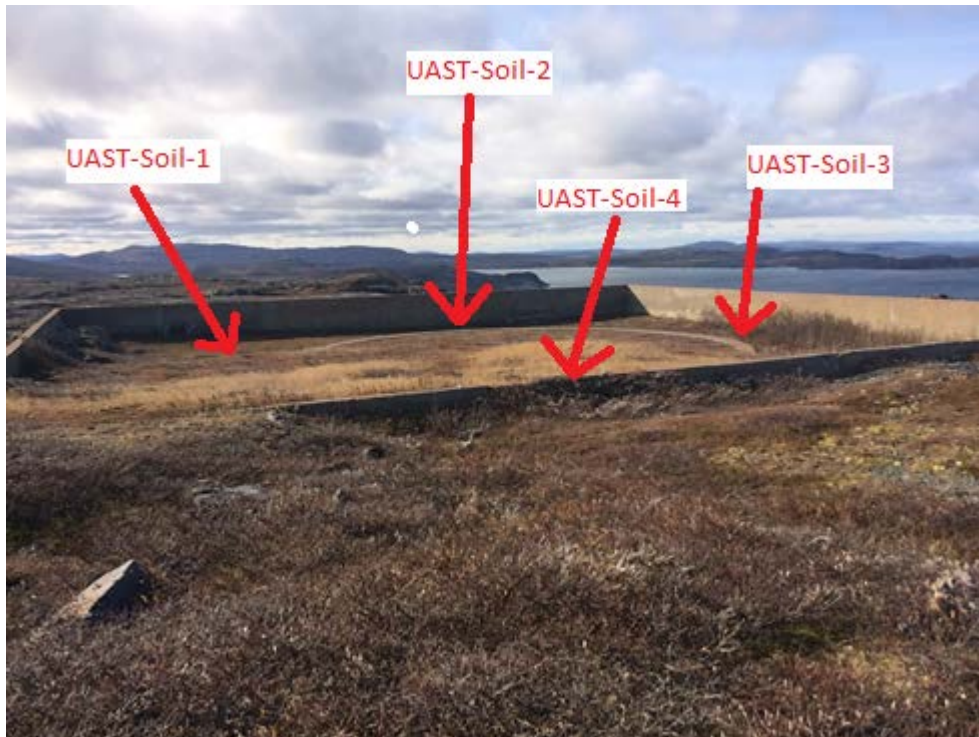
(Upper Site) Concrete Dyke for Former AST Looking South
